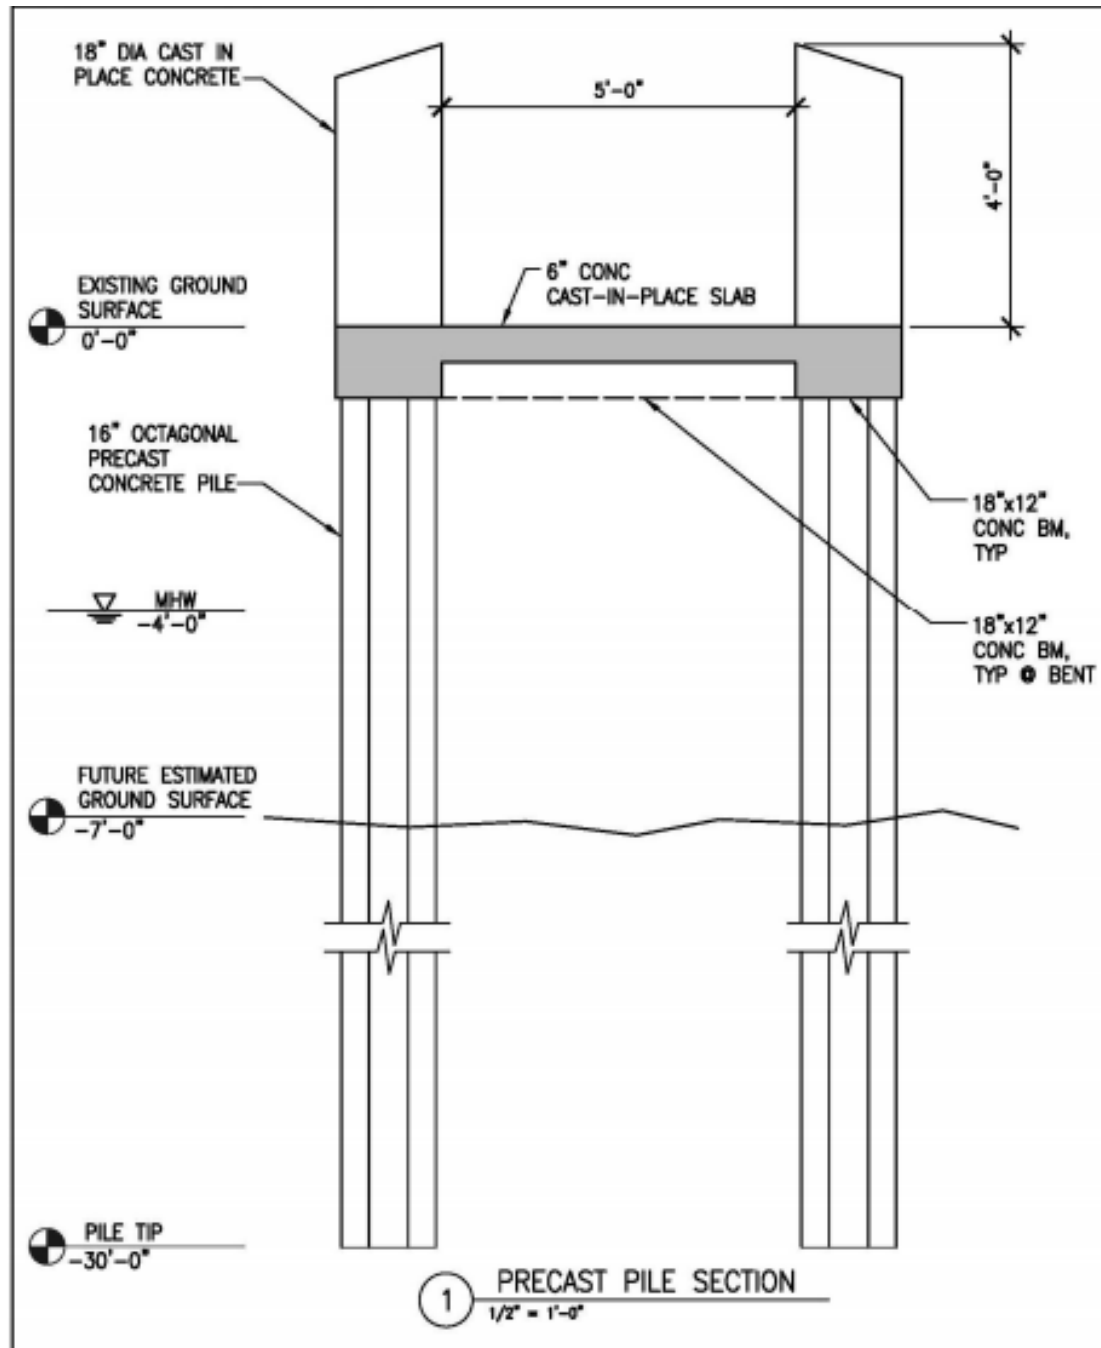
Example section for an elevated boardwalk along Kā'anapali Beach
